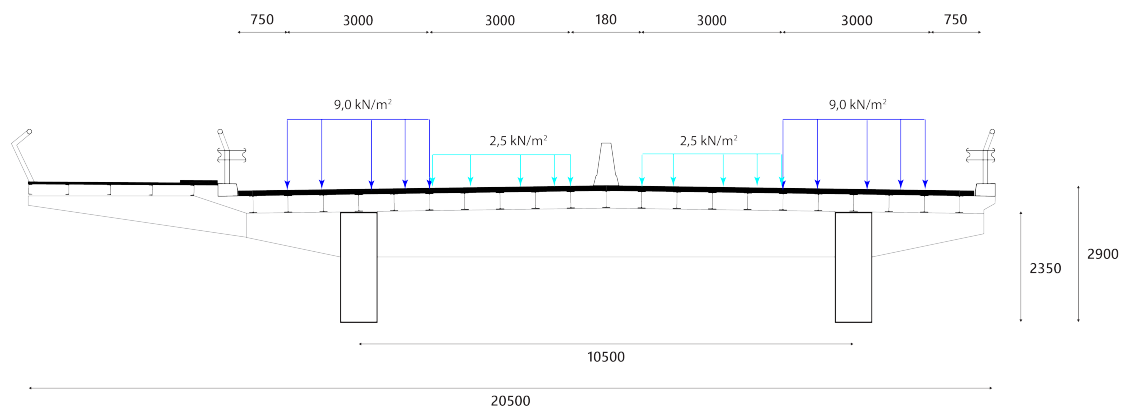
Vertical load case: bridge full of trucks (characteristic) ; cross section of the leaf
